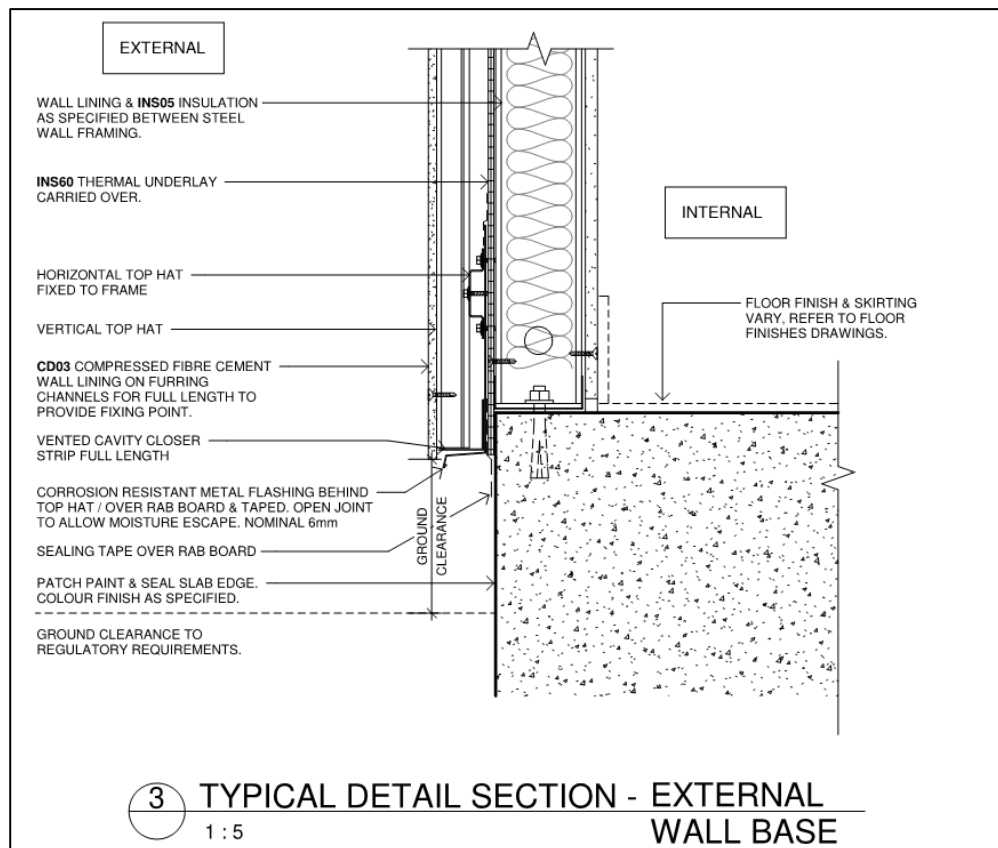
Source – Plan M-AR-DW-5103 Typical Details – Sheet 3
